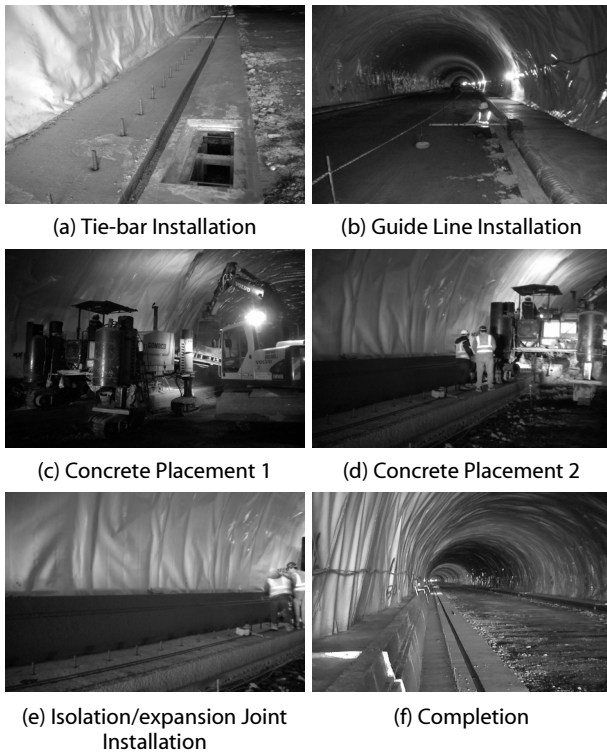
Experimental Construction Process for 3rd Separated Construction
